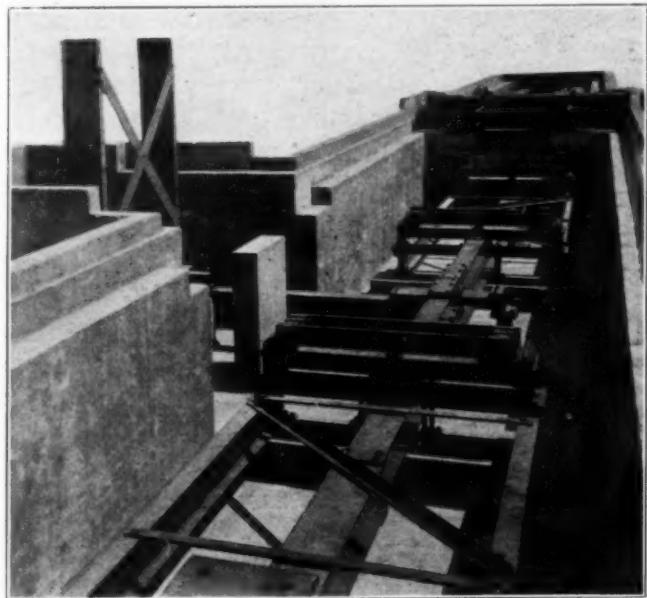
Four-Section Plate Fulcrum Track Scale, First of Its Type to Be Installed
